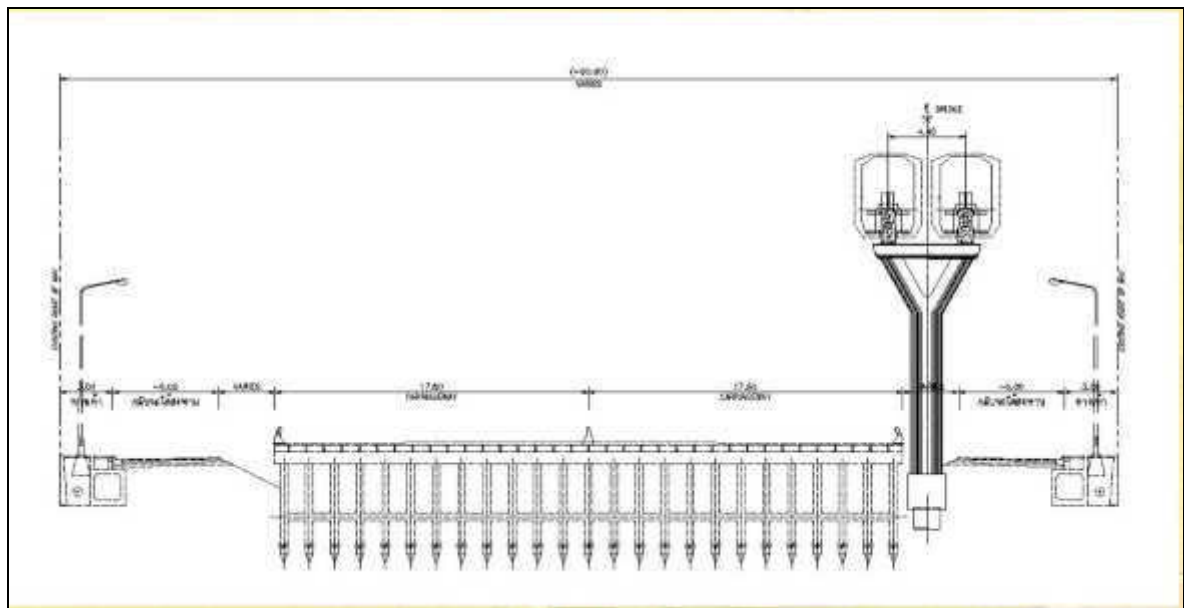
7 Cross section of road at Prawet Burirom Canal, 3<sup>rd</sup> Alternative
